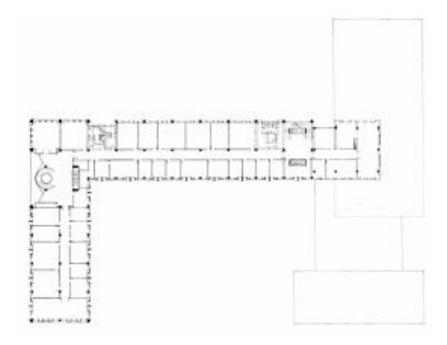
Plan of the fourth floor (Archivio Progetti IUAV)
